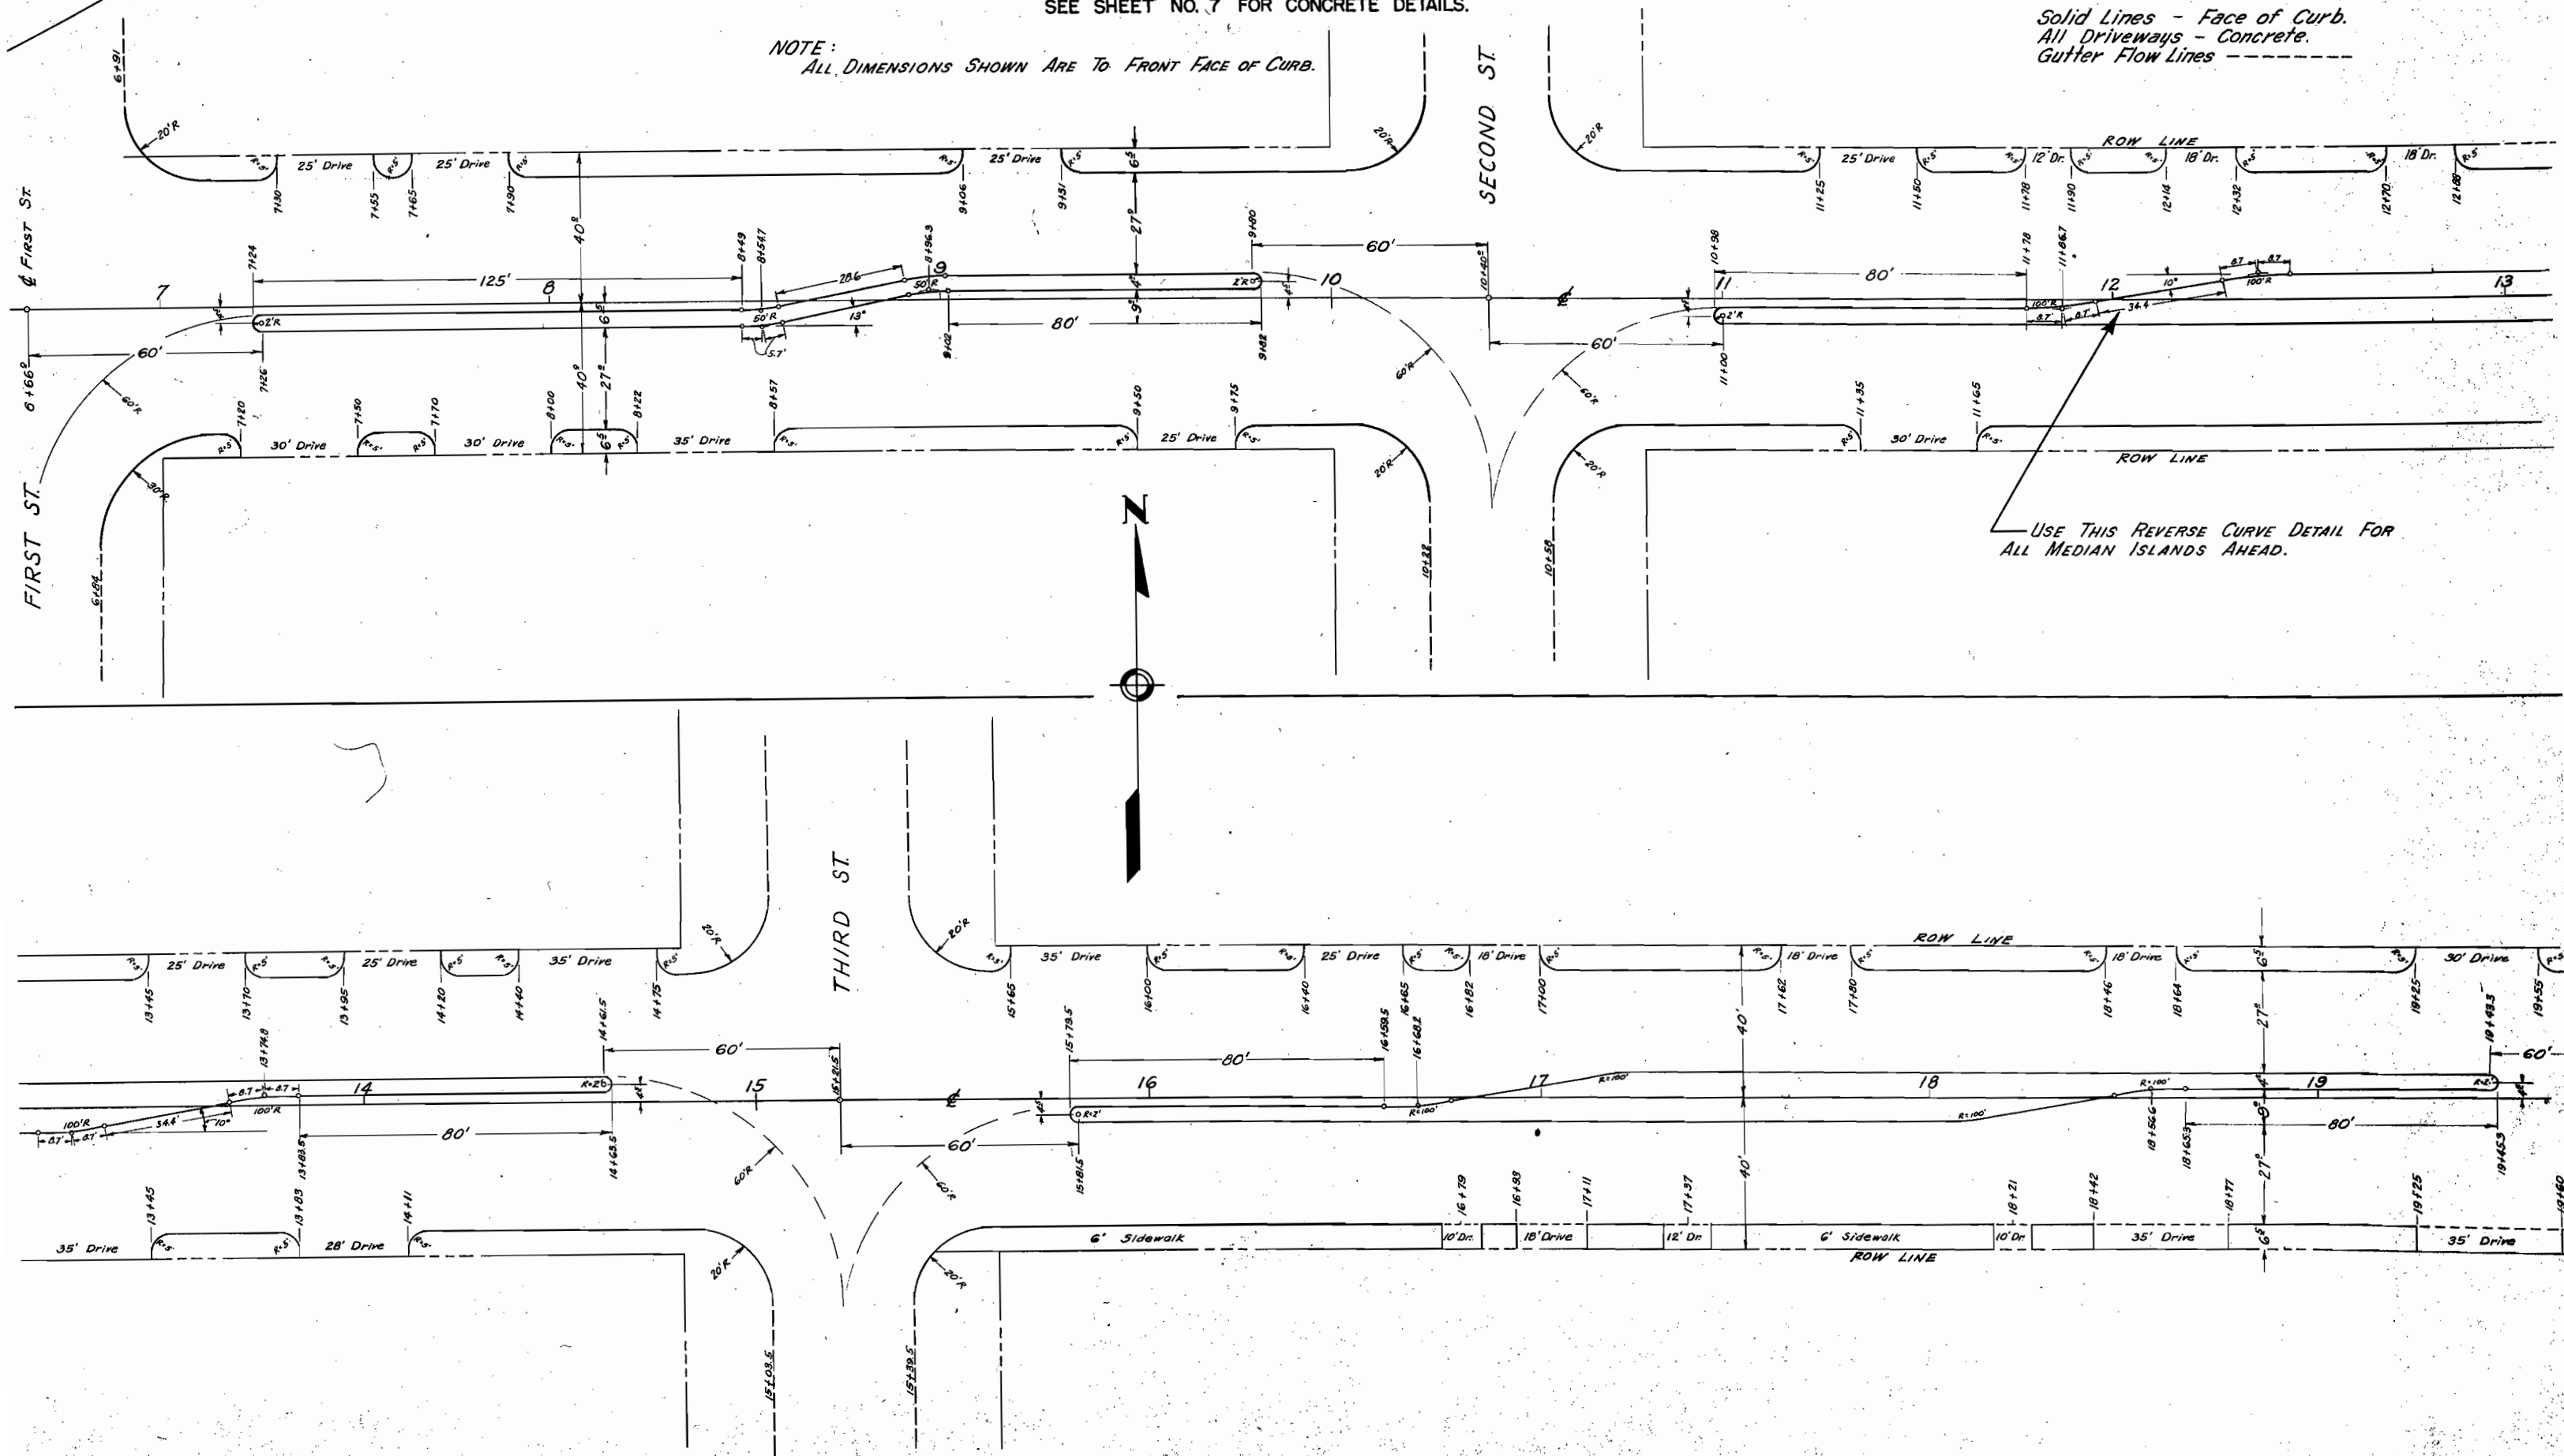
DETAILS-NORTH AVE, FIRST ST. TO FOURTH ST.
